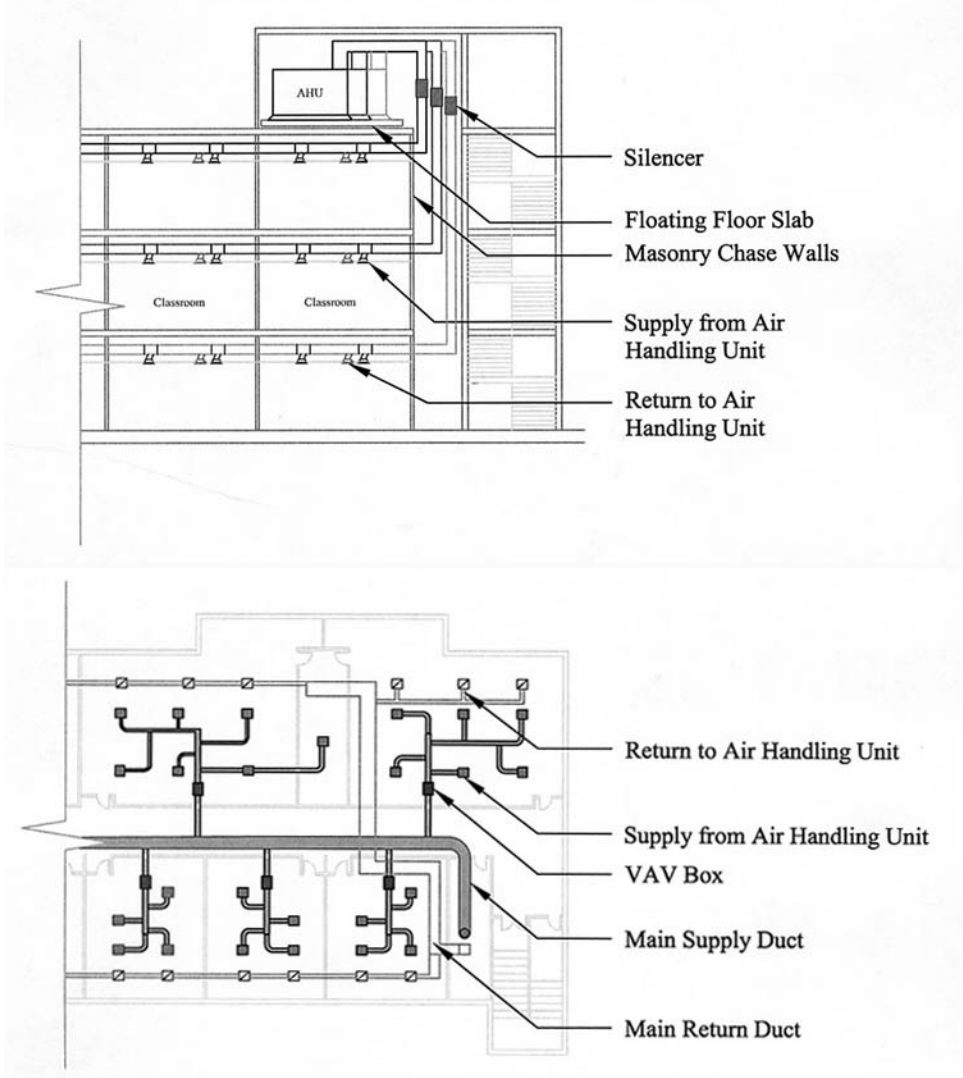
Conceptual section sketch and floor plan of Case Study 7: AHU in Mechanical Penthouse with VAV Terminal Units Over Classrooms.
